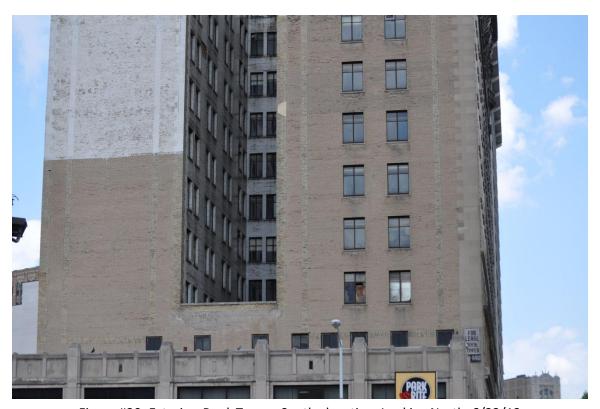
Exterior, Book Tower, South elevation, Looking North. 6/22/12
